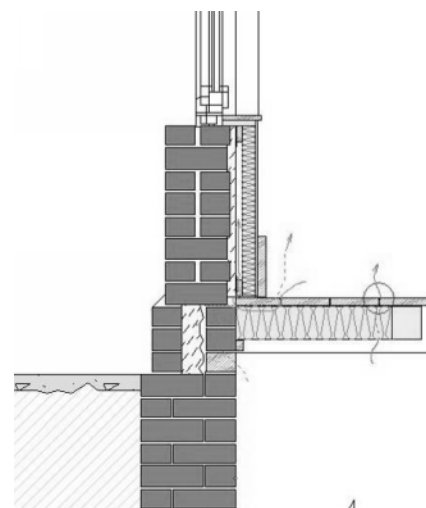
(right) external wall to suspended floor ($U=0.25$)
